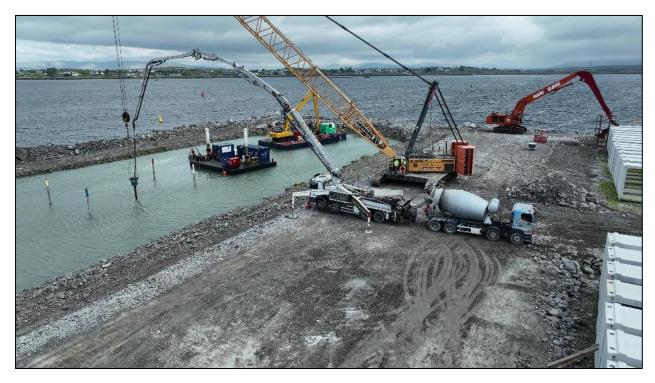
Liquid concrete being delivered via Tremie Pipe and directed by underwater divers to surround and hold the foundation beams in place.
